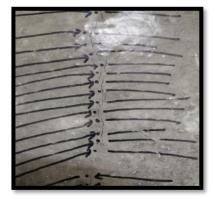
Plastic shrinkage crack in concrete made with P-MF-0.20
